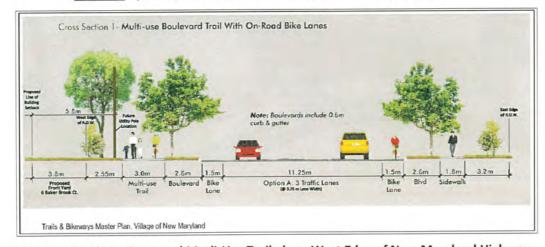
Cross Section - Proposed Mutli-Use Trail along West Edge of New Maryland Highway
